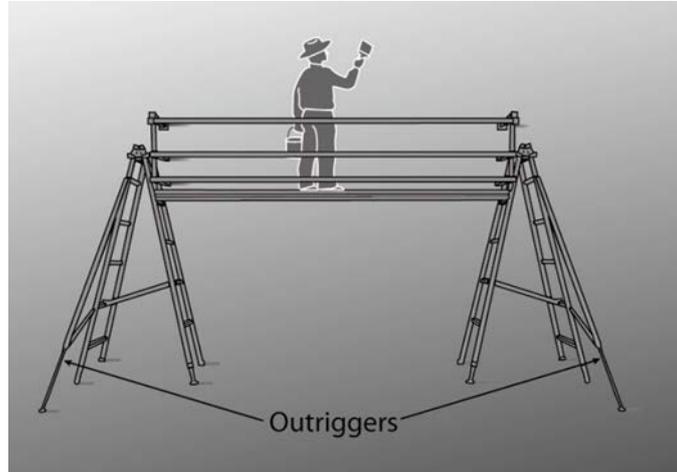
Trestle ladder scaffold with guard rails and outriggers for stability.
